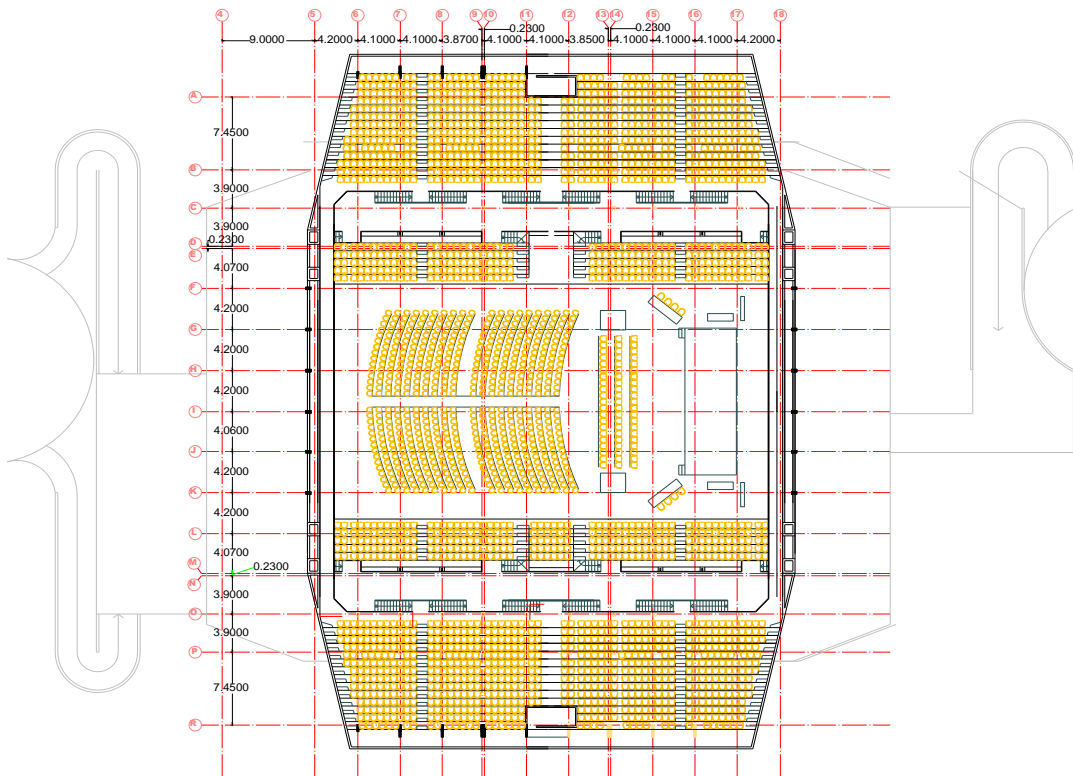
LaLa Mustafa Pasa first floor plan with sitting arrangement [Field study, 2011]
